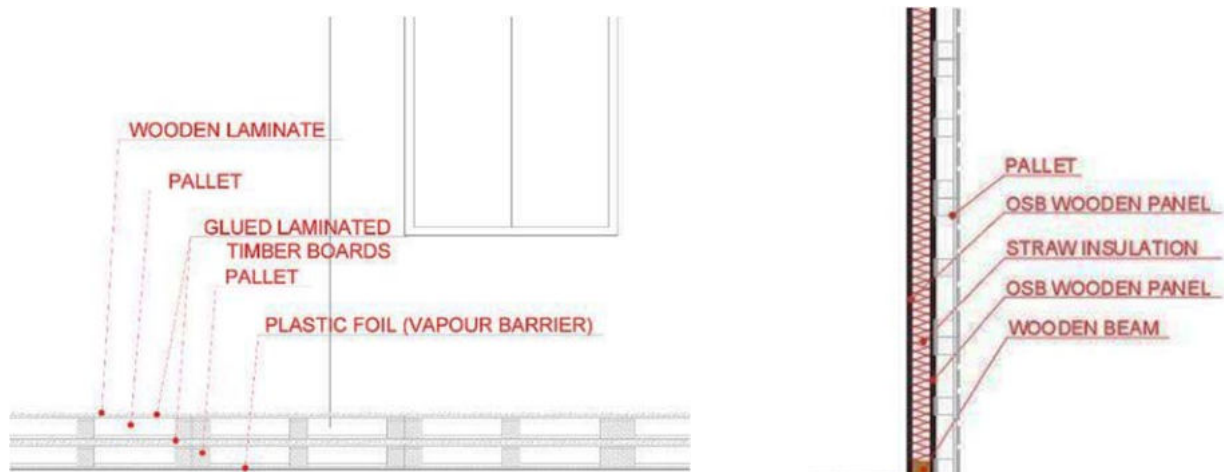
Pallet shelter - Foundation and wall details<sup>19</sup>
